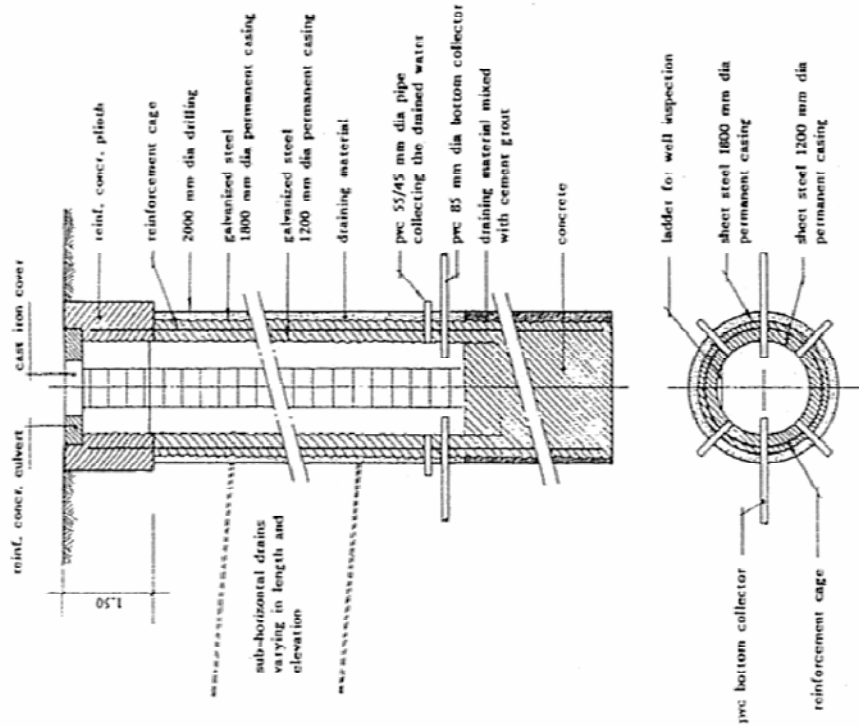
Structural RODREN drainage well.<sup>14</sup>
